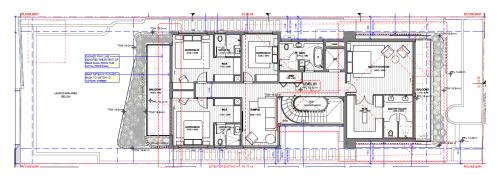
Proposed dwelling first floor plan - 8 Victory Street, Clovelly (Source: BJB Architects Pty Ltd)
